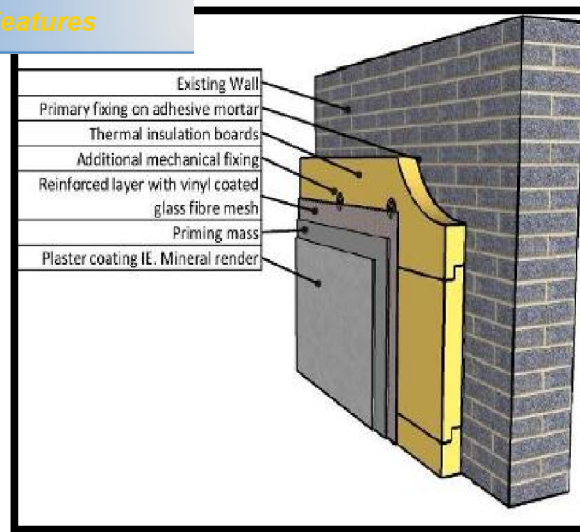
5 External Wall Insulation (Sourced wallinsulation.ie (2012))
